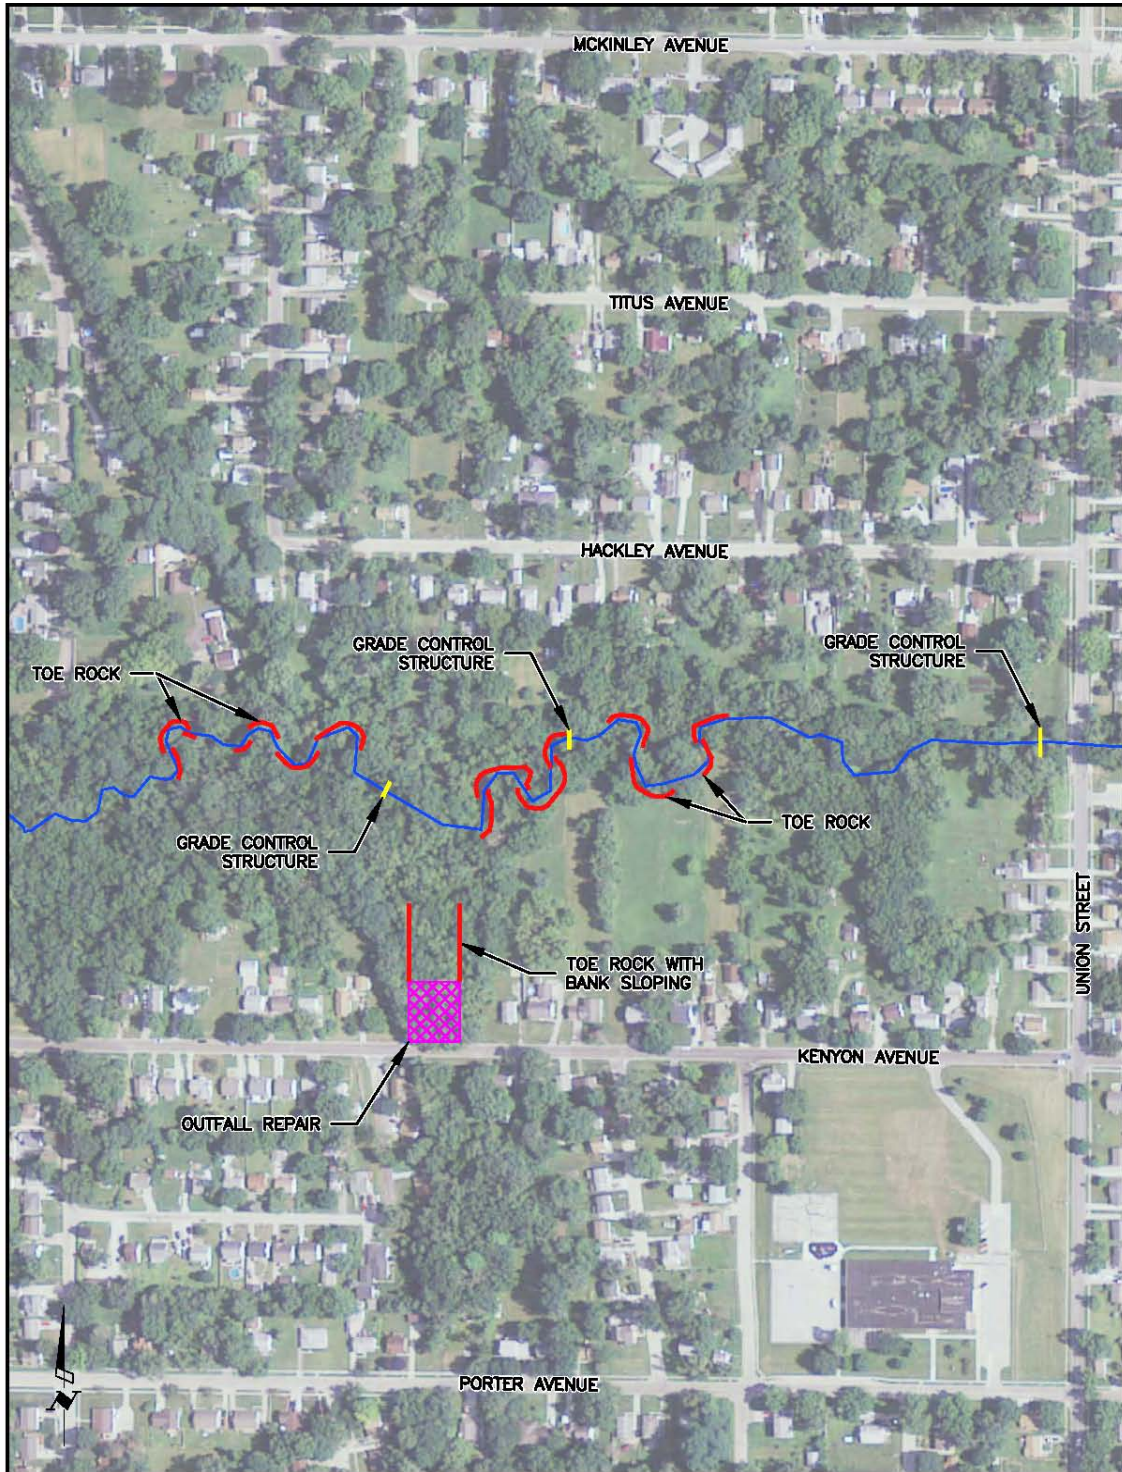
Main Branch from Southwest 8th Street to South Union Street
